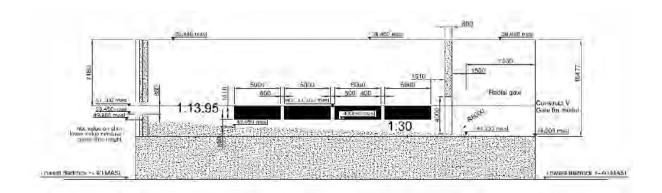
Proposed BRVAS abstraction works section D-D (Gravel trap left bank trap)
